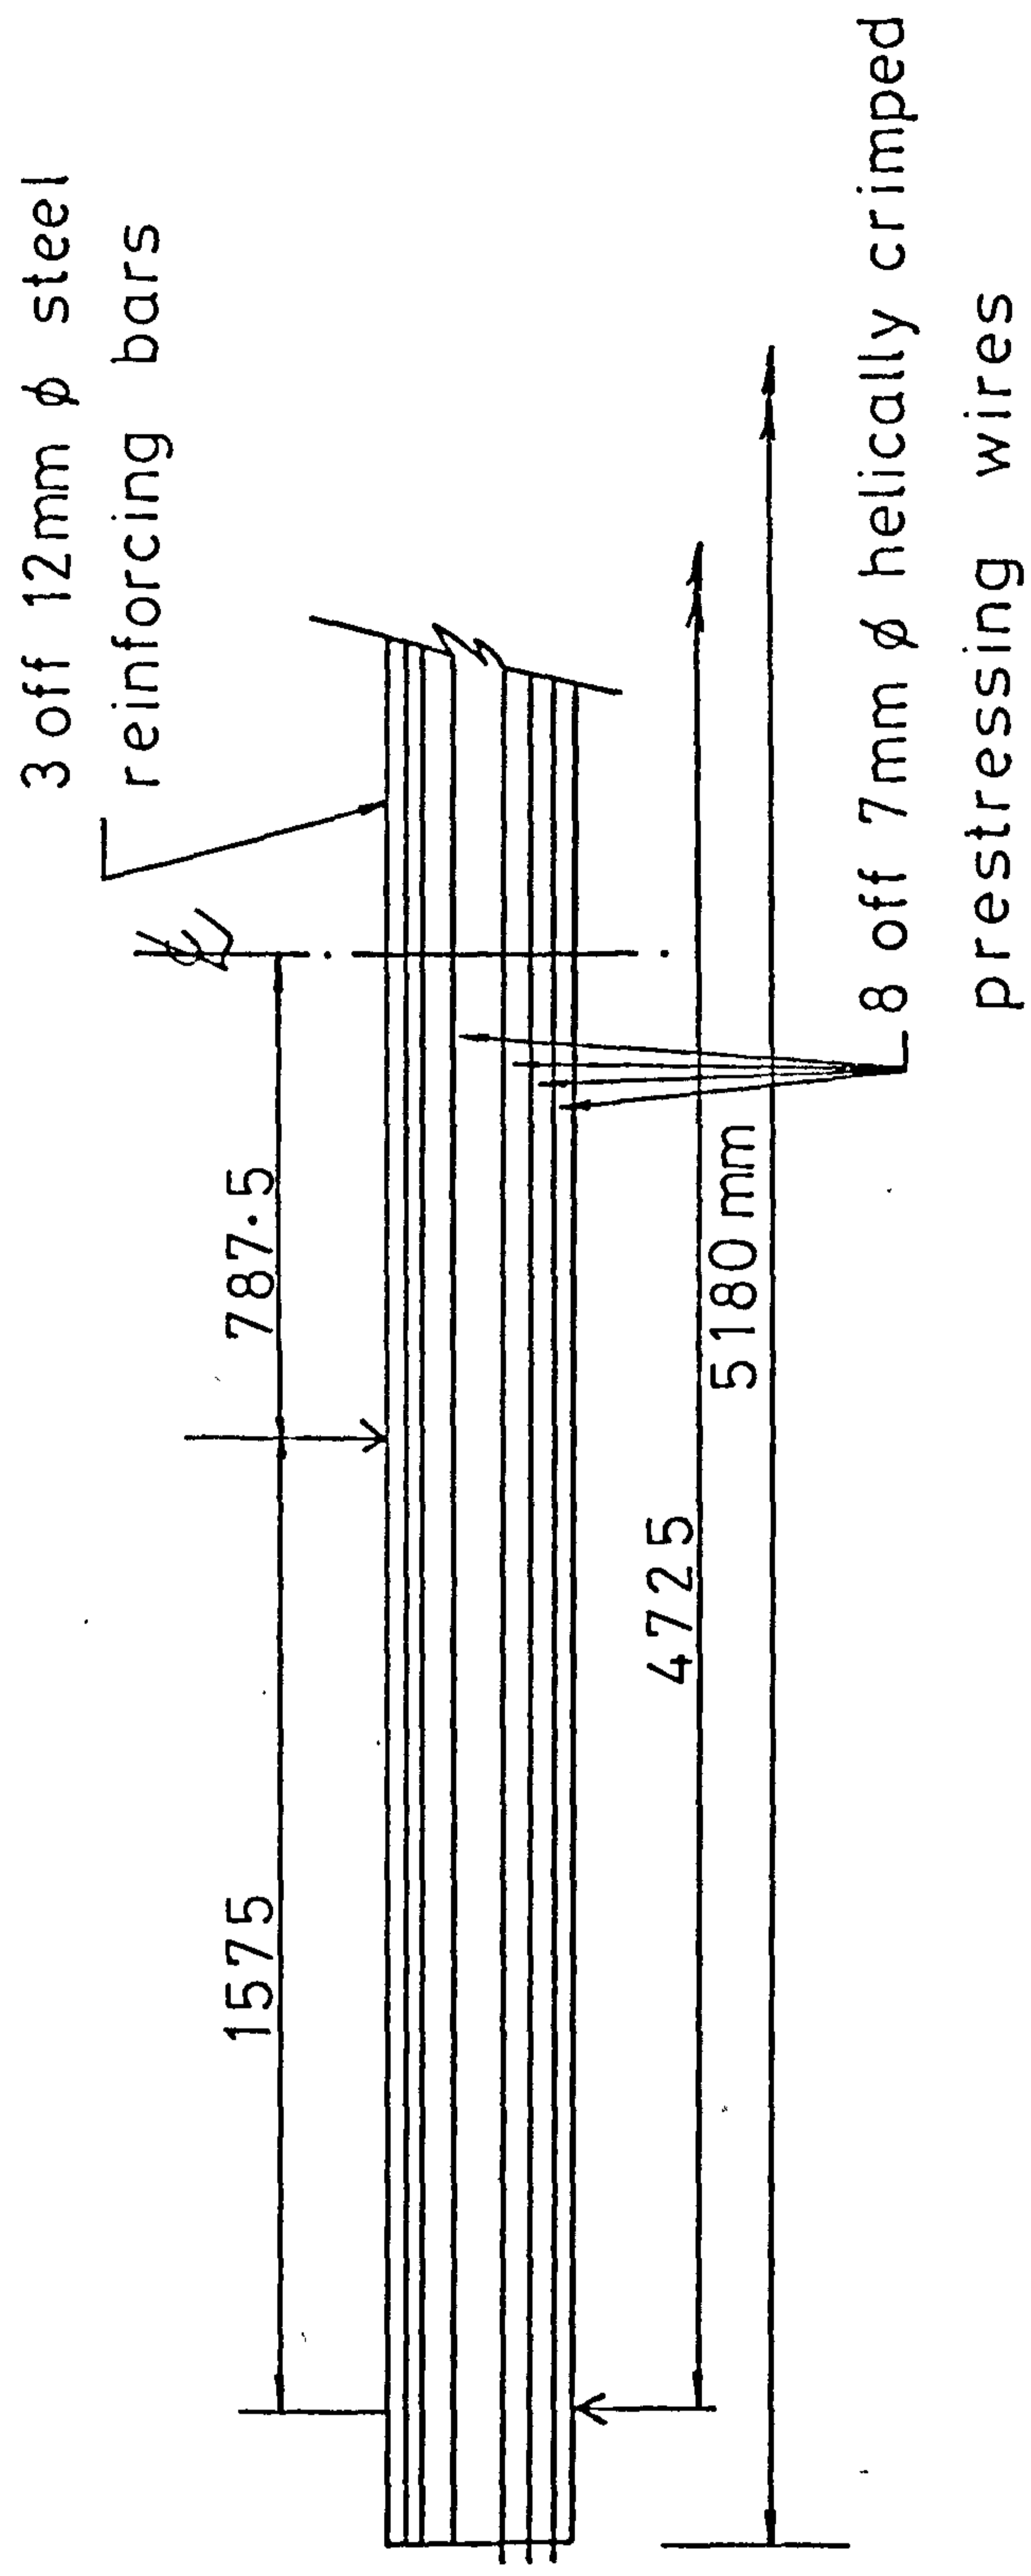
T BEAM LONGITUDINAL SECTION -
